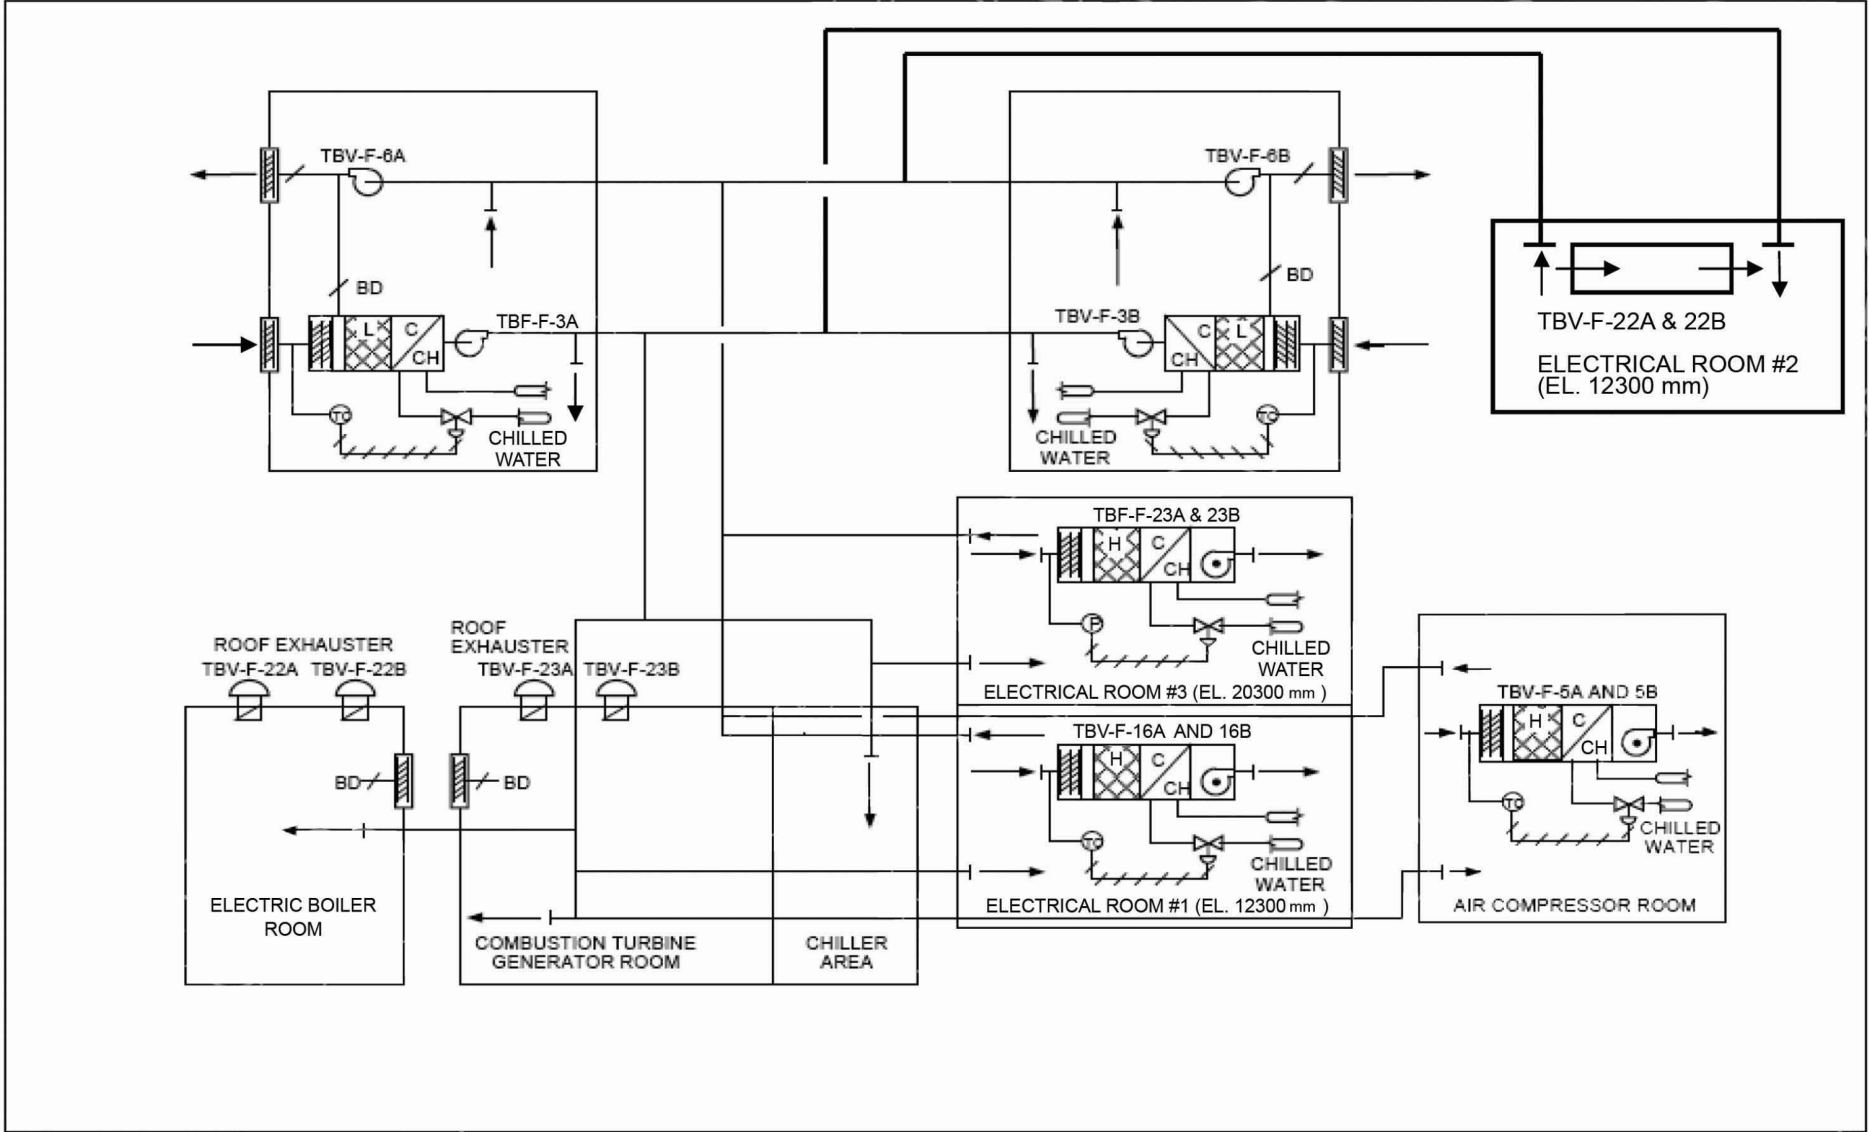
Electrical Building HVAC System Diagram Turbine Building Electrical Equipment Areas (EEA) HVAC System Diagram
